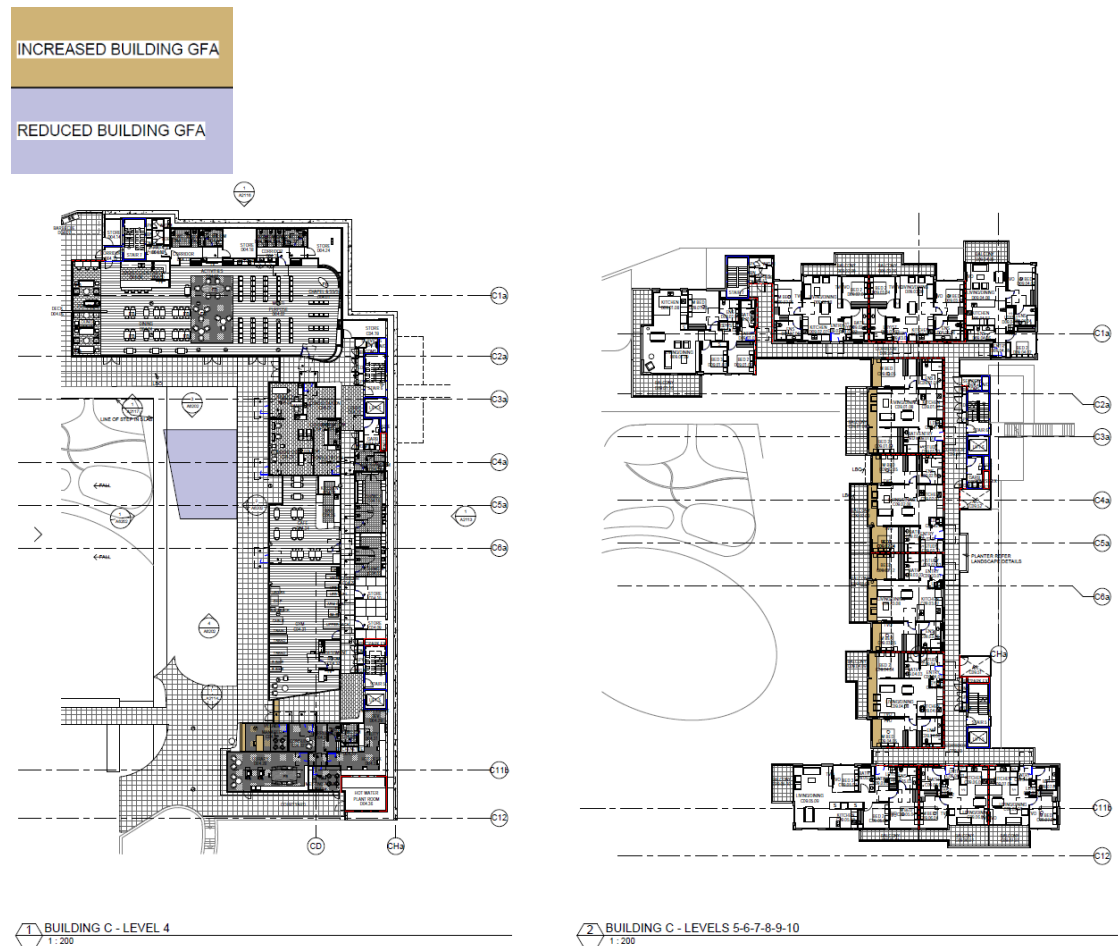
GFA comparison plan (Building C) (Source: PTW Architects)
